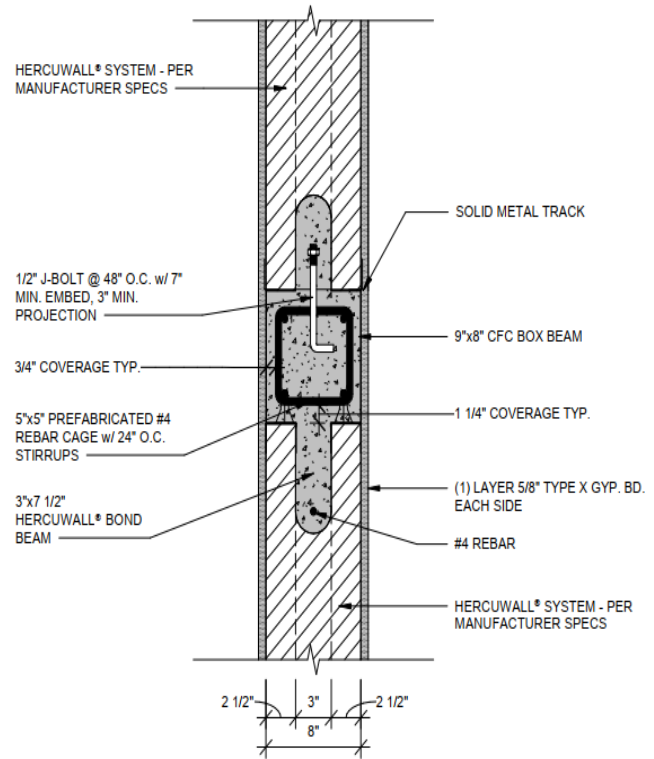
1-hr Load-Bearing Unbraced CFC Box Beam Wall
